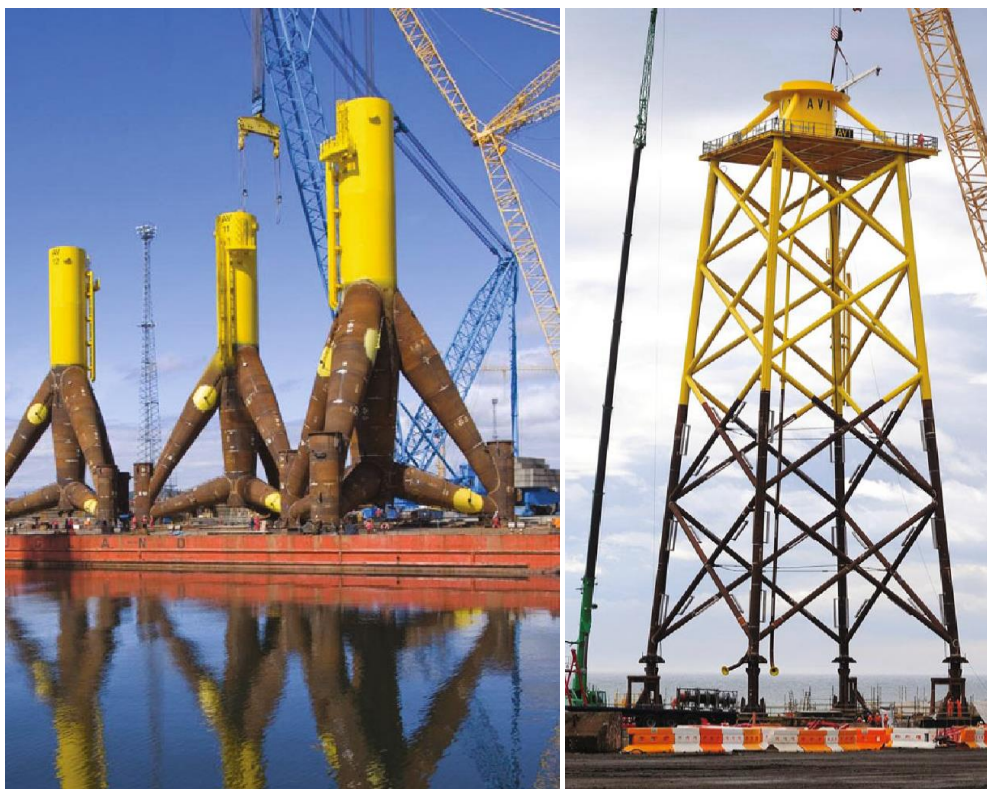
Tripod foundations (left) and jacket foundation (right) (source: 'Alpha Ventus')
